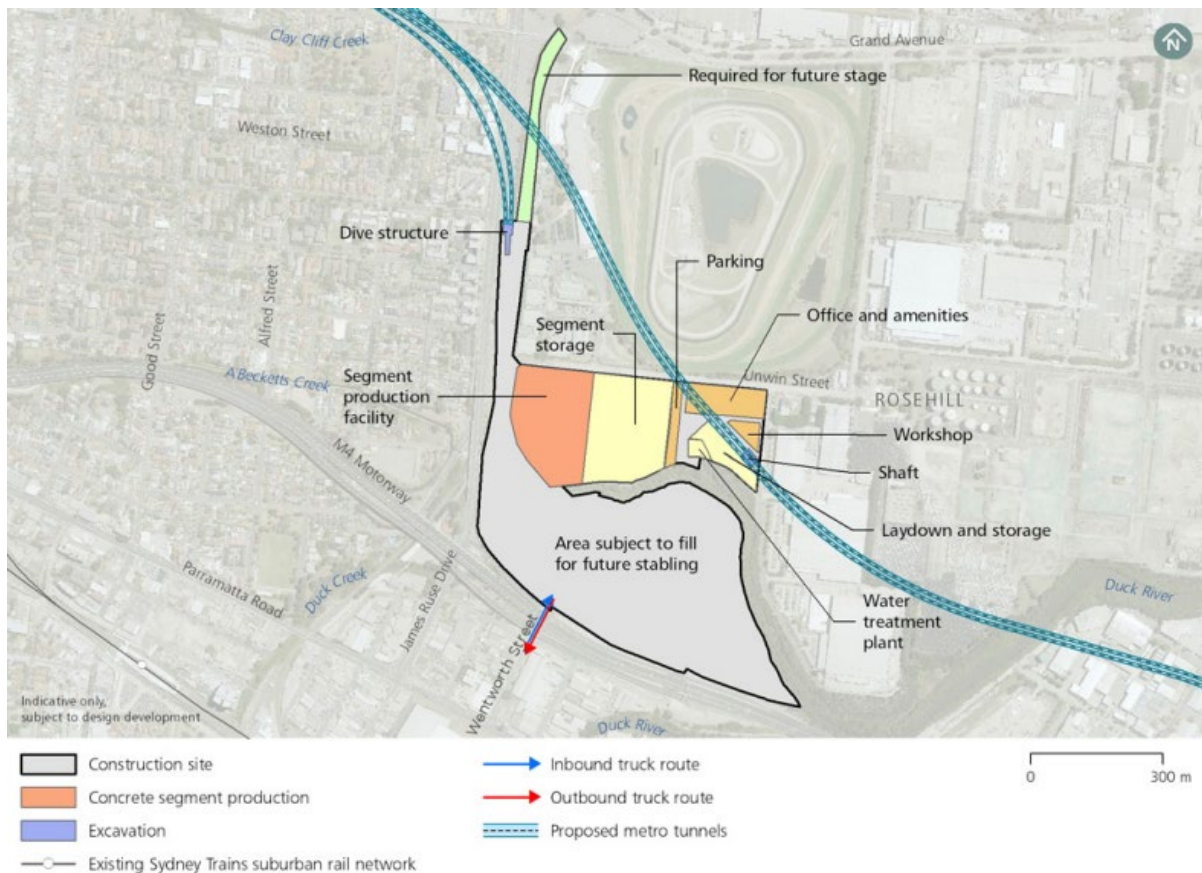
| Approved Clyde stabling and maintenance facility construction site and Rosehill dive structure (Source: Sydney Metro)
